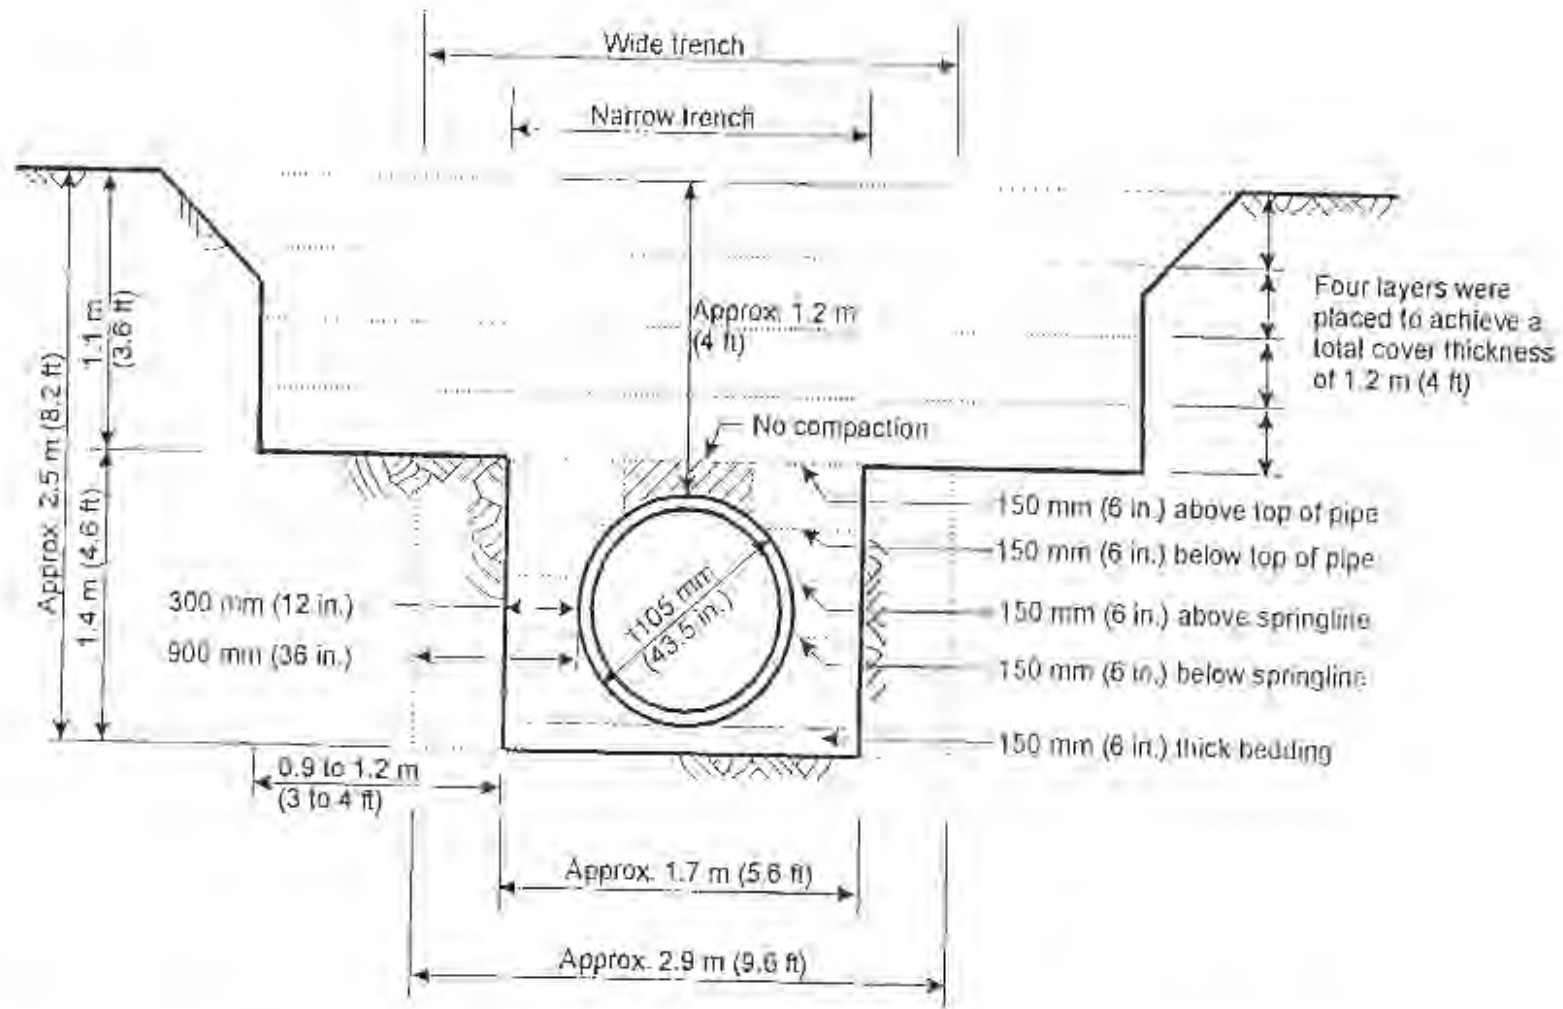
Typical Trench Cross-Section and Backfill Layer Thicknesses for 900 mm (36 in.) Diameter Concrete Pipes (Section for Plastic and Metal Pipes Similar)
